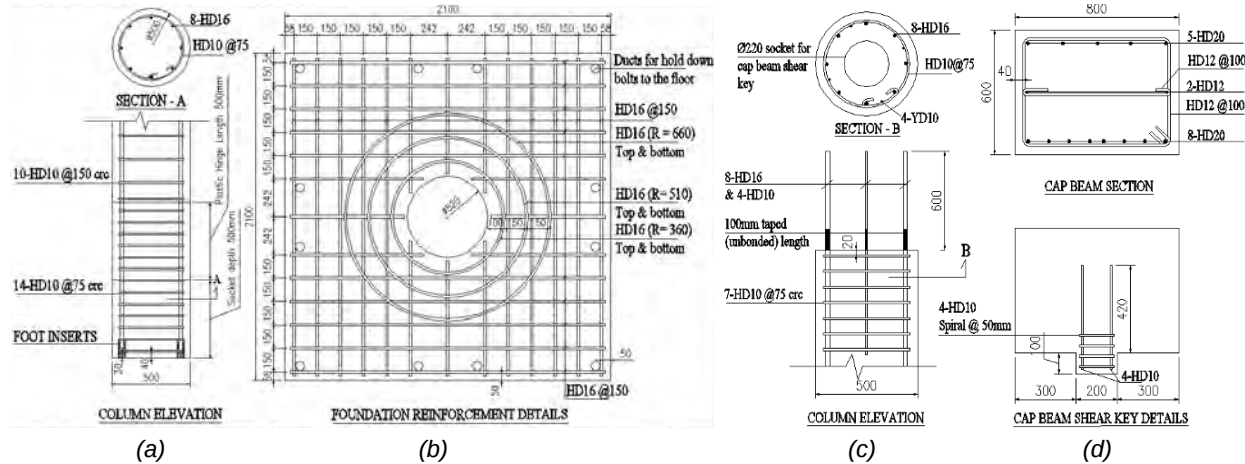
(a) Column bottom section and details, (b) Member socket footing reinforcement and details, (c) Column top section, starter bars, and details, (d) Cap beam section, shear key, and details
